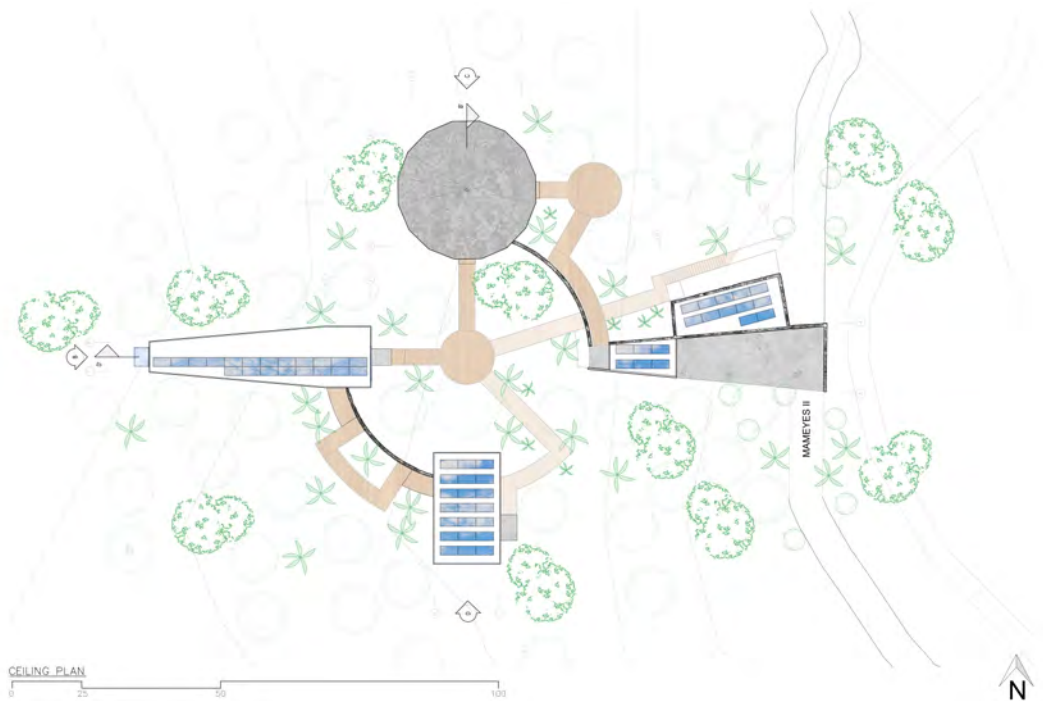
Proposed Roof Plan. Diagram by student Reinaldo E. Hernandez Aracena.
